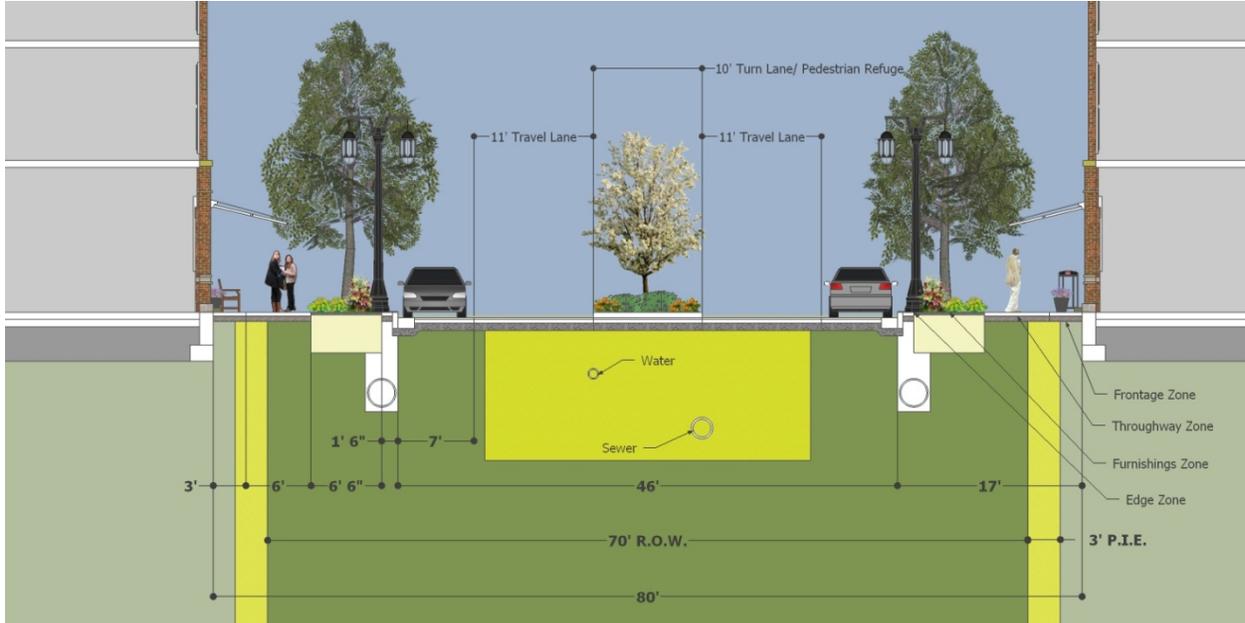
Commercial Street (ST-70-46) with two travel lanes and center turning lane, north area of property. Right-of-way may be reduced to 48 feet when streetside areas are put into private ownership. PUEs are planned in alleys. Where necessary, PUEs will be provided along street right-of-way edges in order to provide connectivity in the system, based on a comprehensive PUE design established at Schematic Development Plan. See Figure 7 for typical street-edge PUE location.
